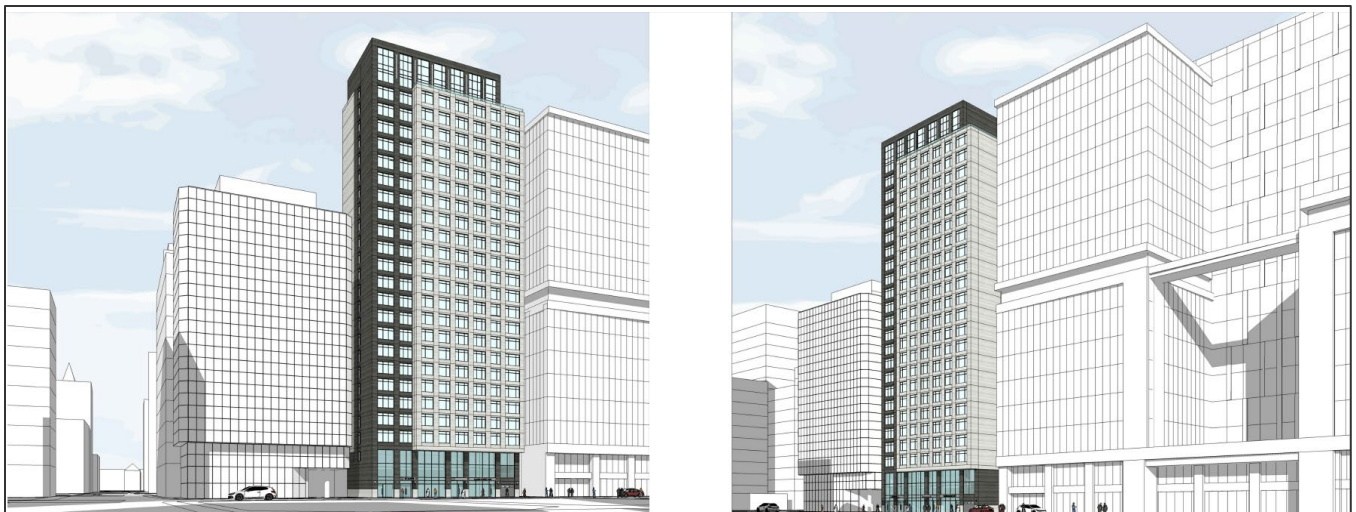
Views of the Proposed Development, Looking North (Left) and Northwest (Right) from Slater Street
